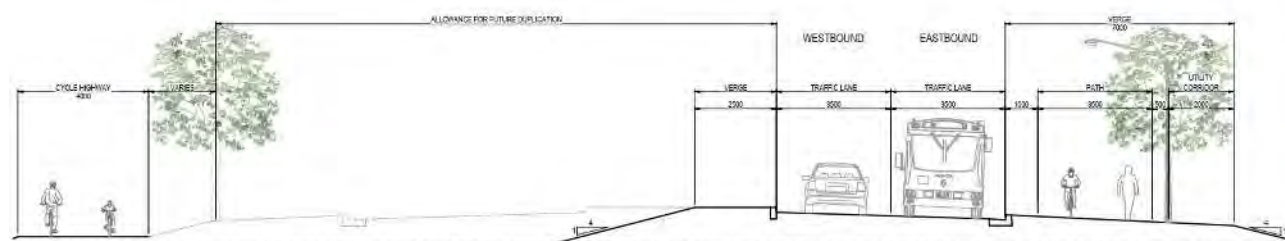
Typical cross section – Molonglo Town Centre to Molonglo 3 East Connector Road
